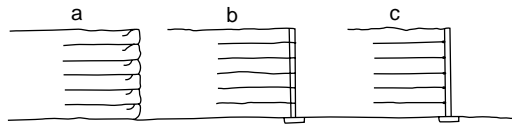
Reinforced retaining wall systems using geosynthetics: (a) with wraparound geosynthetic facing, (b) with segmented precast concrete or timber panels, and (c) with full height (“propped”) precast panels.
